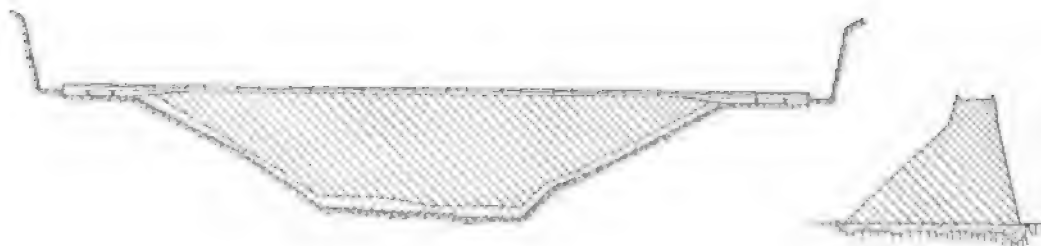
Longitudinal and Cross Sections of Gileppe Barrage.
